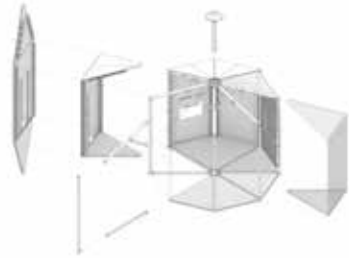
Exploded axonometric view of the Umbrella Shelter
